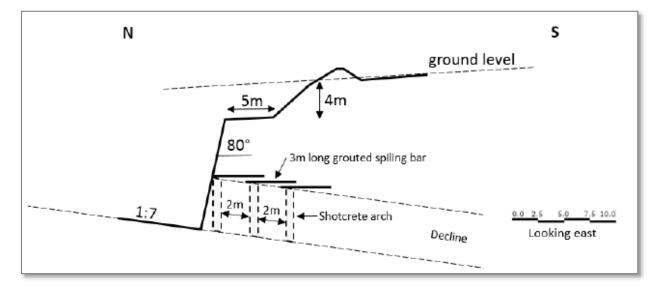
| LONG SECTION OF PROPOSED BOXCUT SHOWING BENCH ANGLES, AS WELL AS INITIAL PORTAL GROUND SUPPORT RECOMMENDATIONS AS DETERMINED FROM GEOTECHNICAL INVESTIGATIONS (APPENDIX M1)
